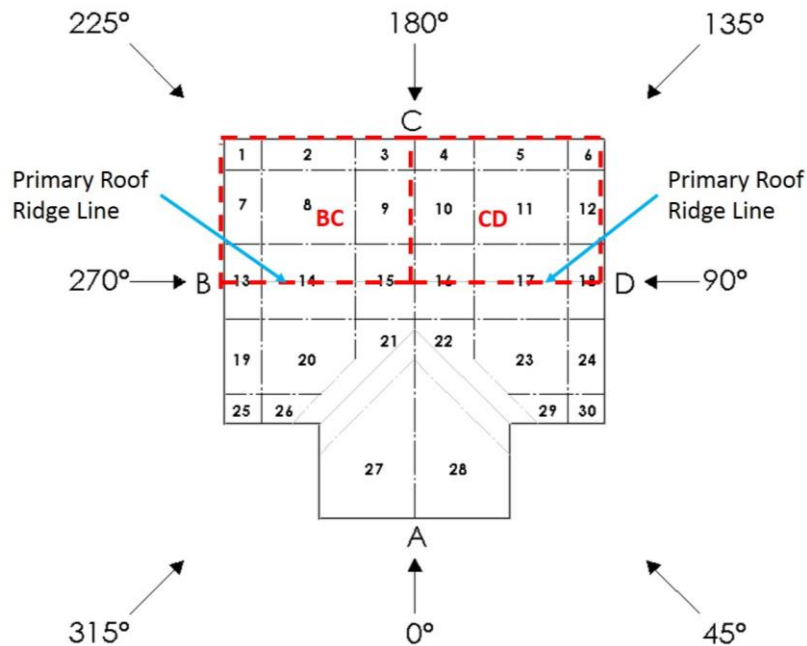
Conceptual drawing for full-scale test building, showing roof drainage zones, quadrants BC and CD, and building orientations.
